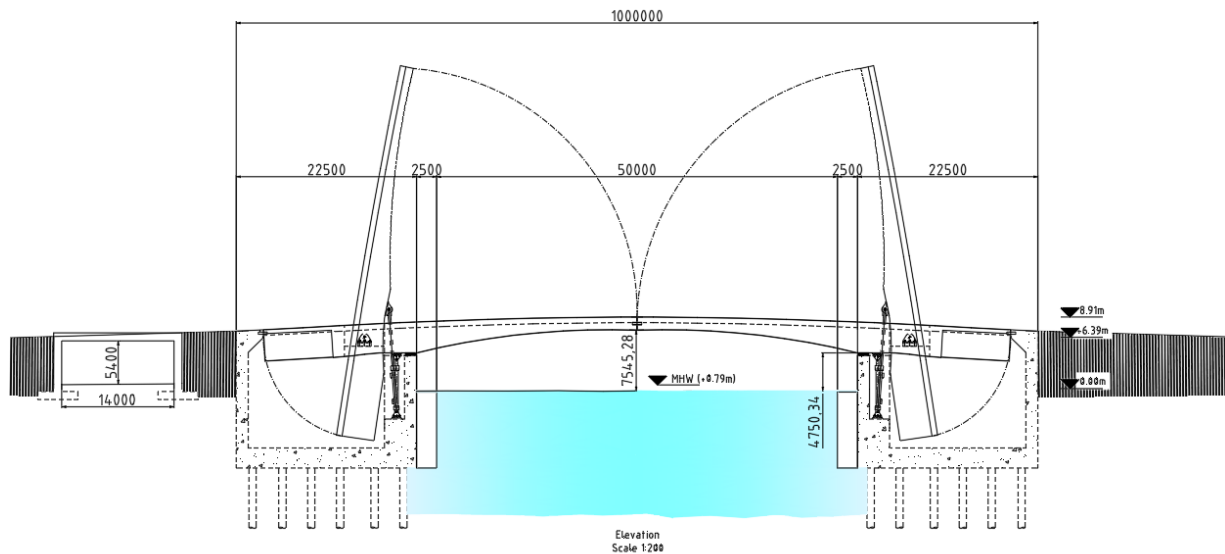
Elevation of the proposed bascule bridge (adapted Mouchel's report)
